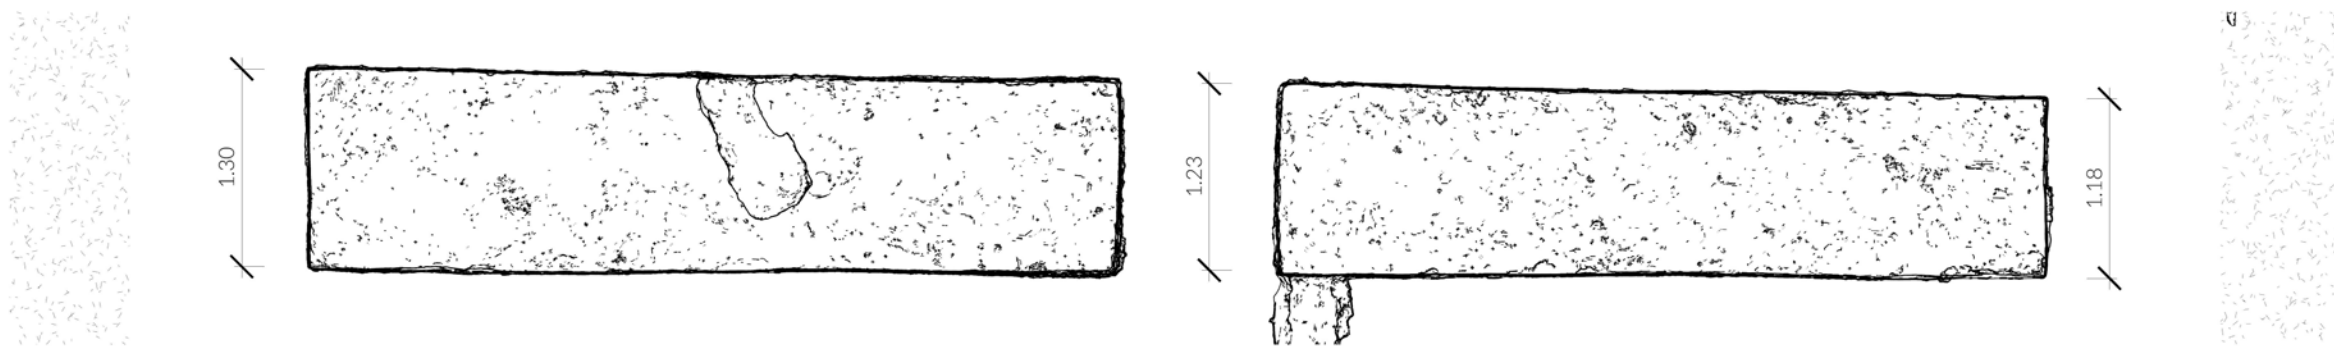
Floor plan YKK1 - YKK2, 1: 50
